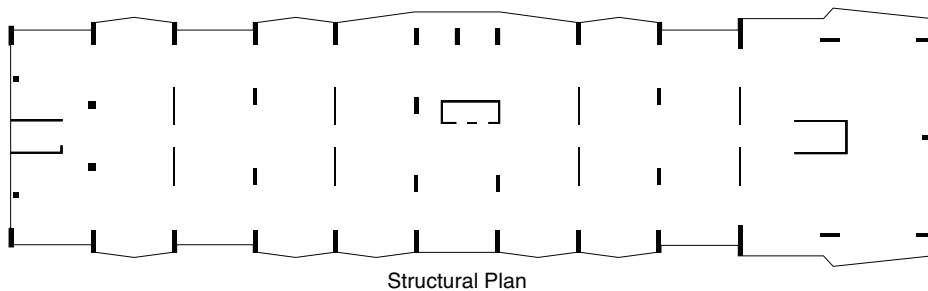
The structural plan of the archetype tower building shows the use of shear walls arranged according to a spacing that reflects the optimal utilization of below grade space for parking stalls and drive aisles.
